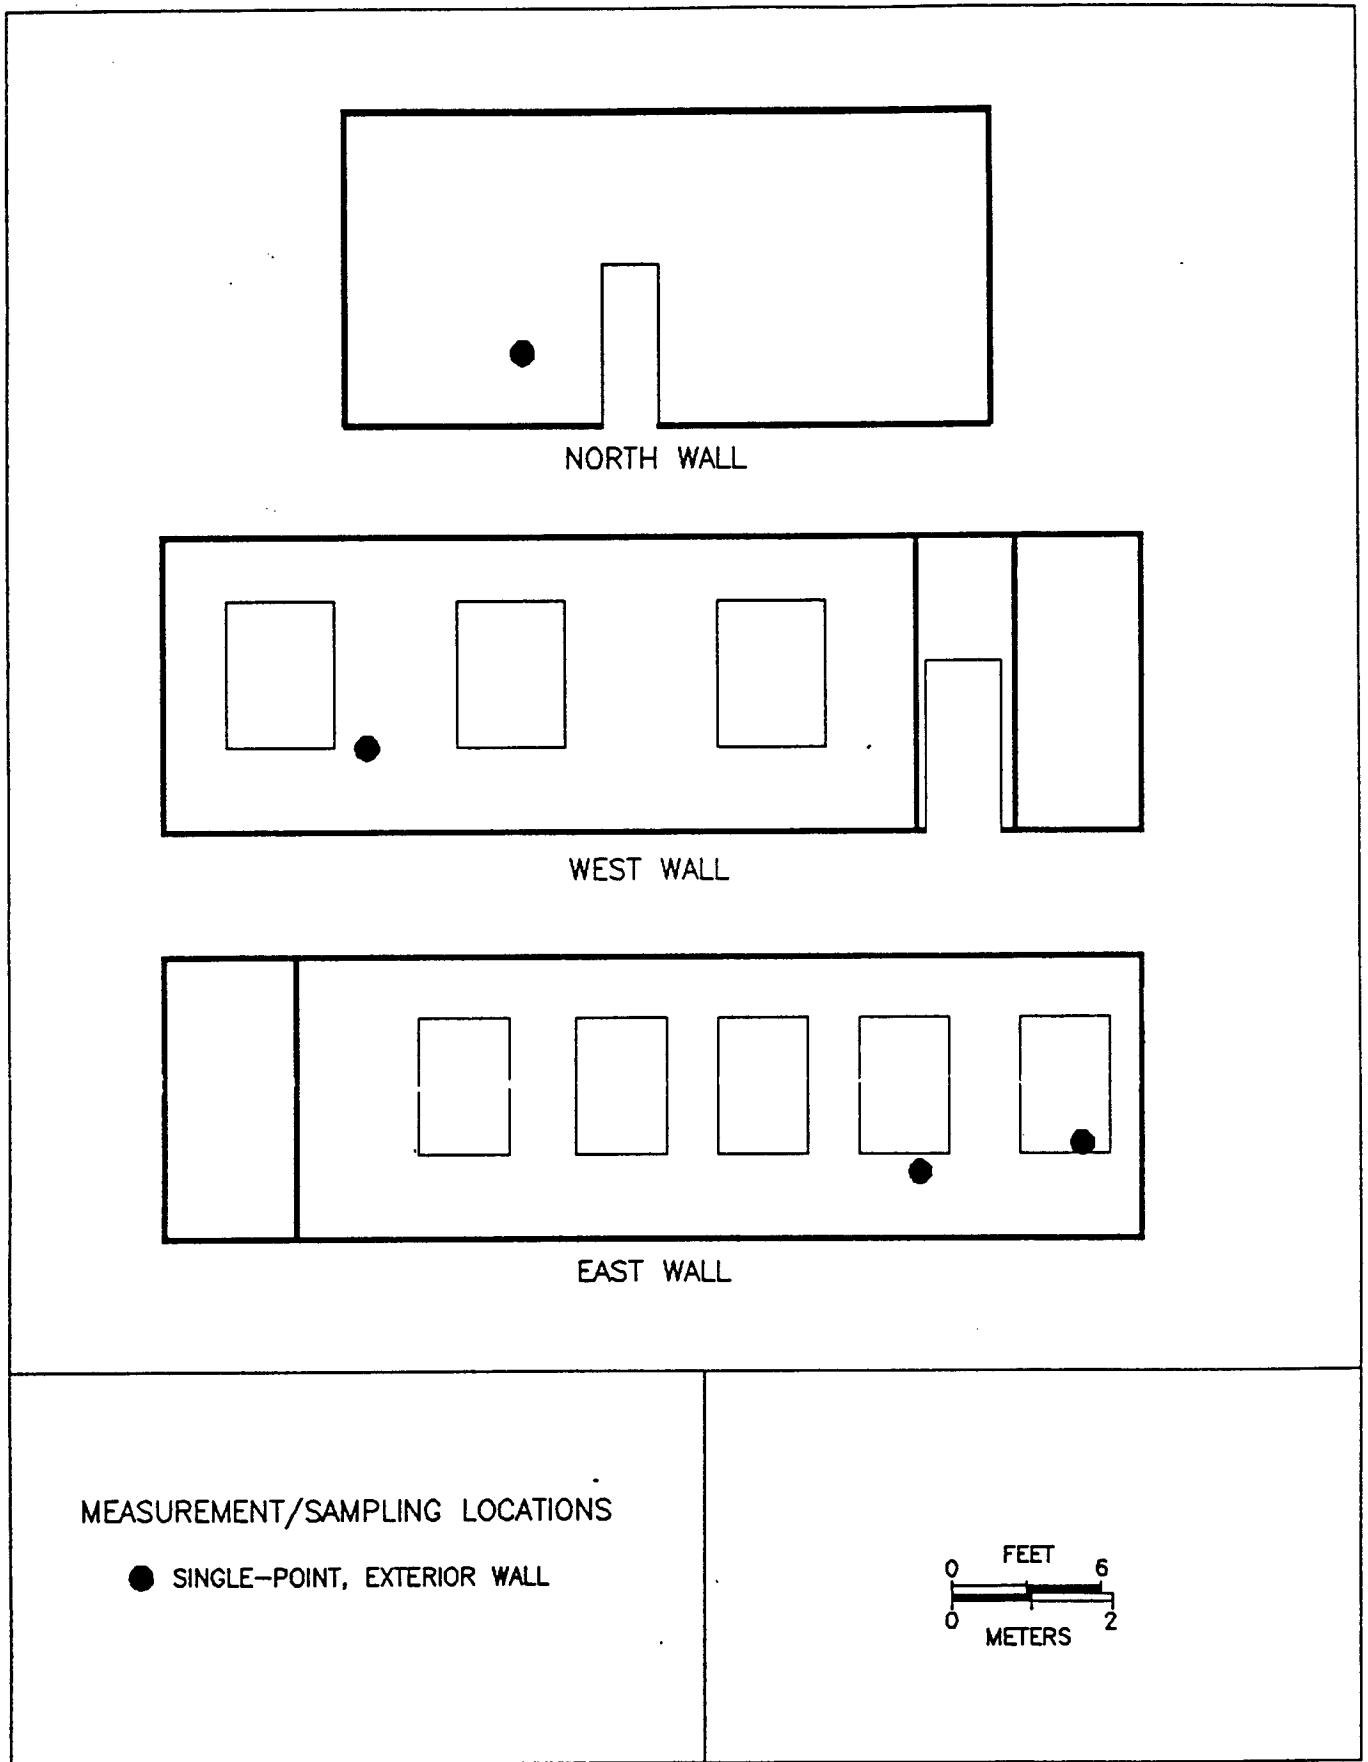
Building 401A, Exterior Walls — Measurement and Sampling Locations
